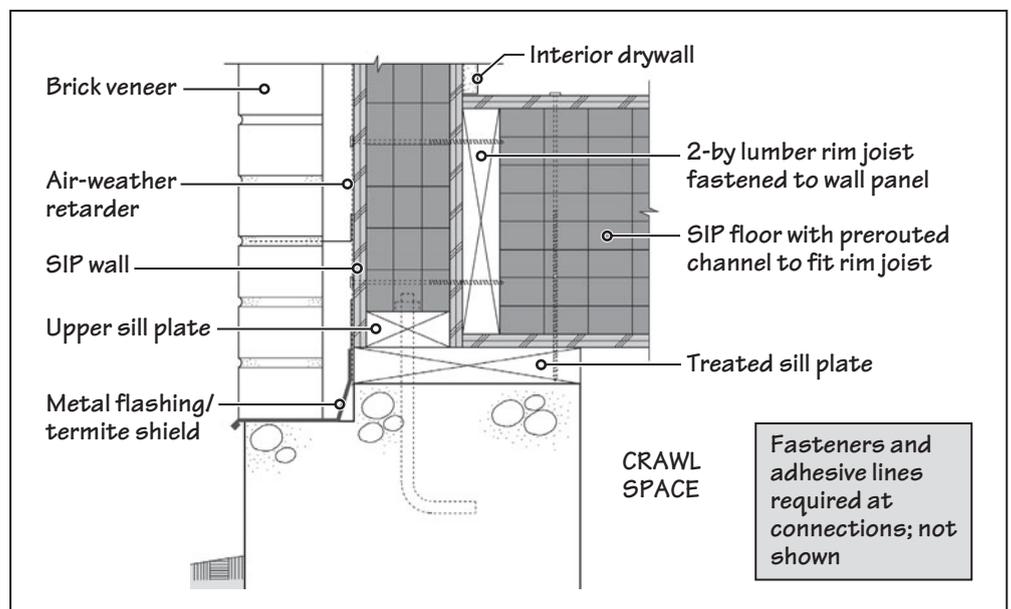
Typical detail of the anchorage of structural insulated wall panels to a foundation with a crawl space.
